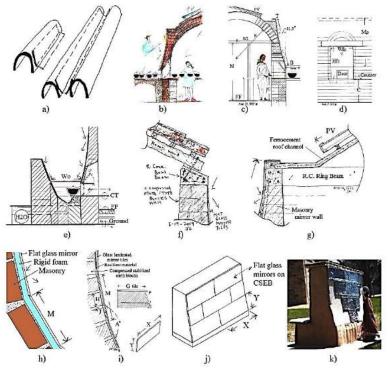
TRW Exterior CPC building structure studies: a) one and two sided CPC EW-line troughs supported on masonry vaults; b-c) section studies of masonry vaults with flat glass mirror tiles; d) interior elevation drawing of lintel on masonry wall above cookware door; e) section drawing two sided asymmetric CPC trough; f) tile roof above CSEB wall at nonimaging
